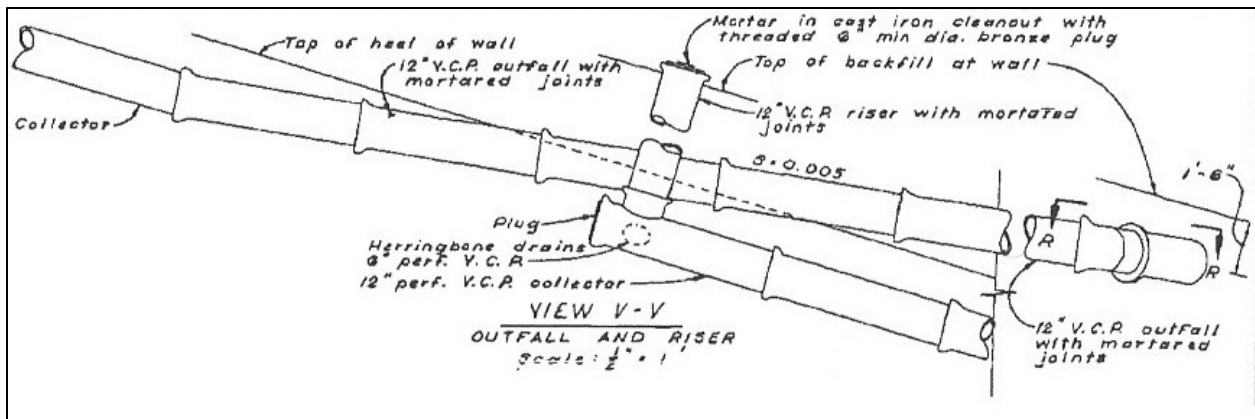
Collector Drain and Outfall, Reference [B-8]
